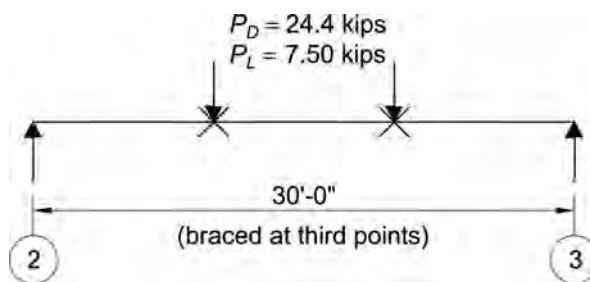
Loading and bracing diagram for typical interior girder with wet concrete and construction loads.
